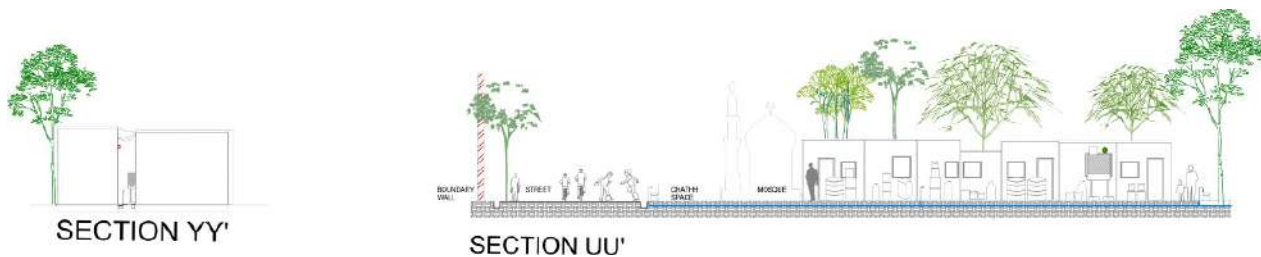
Lack of drainage as per slope leads to water logging on the streets.
